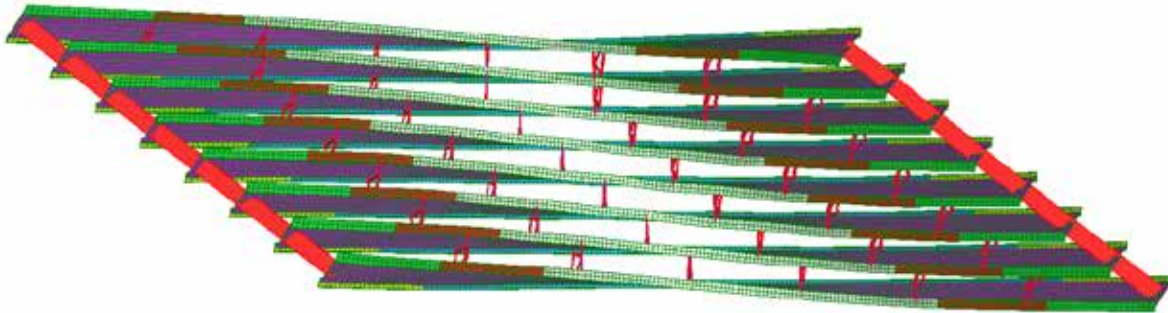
Plan View of Girder Layovers from ROUTE 3 Bridge Model (Rotations magnified for display)
